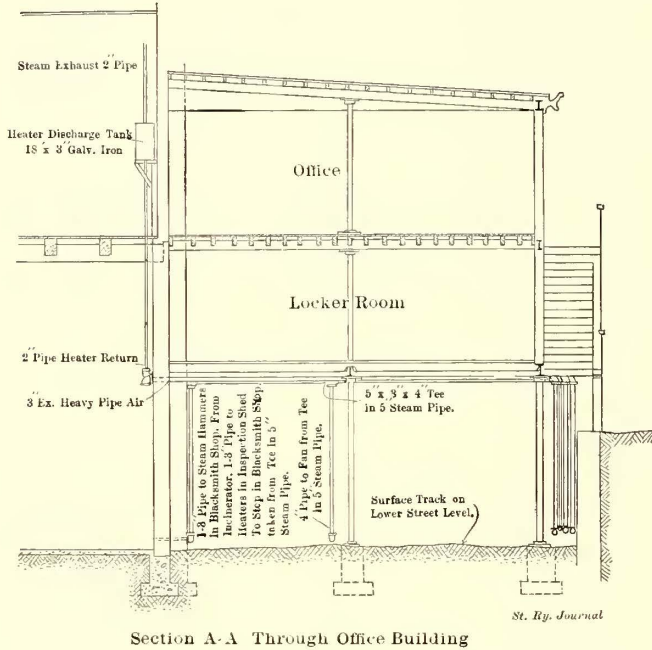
SECTION THROUGH OFFICE BUILDING, SHOWING THE HEATING PIPES UNDER THE LOCKER ROOM
